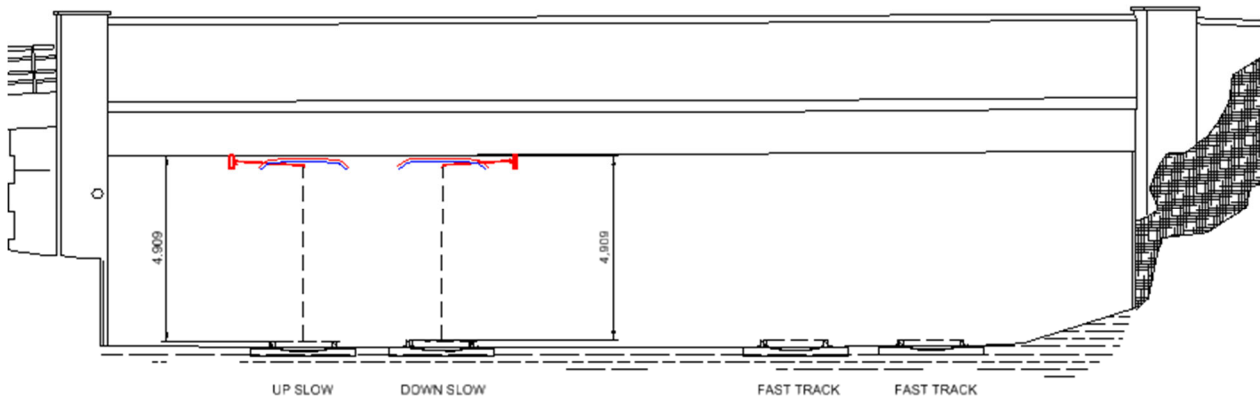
Example Cross Section for Fitted OHLE System in Four Tracking Area – Facing East
